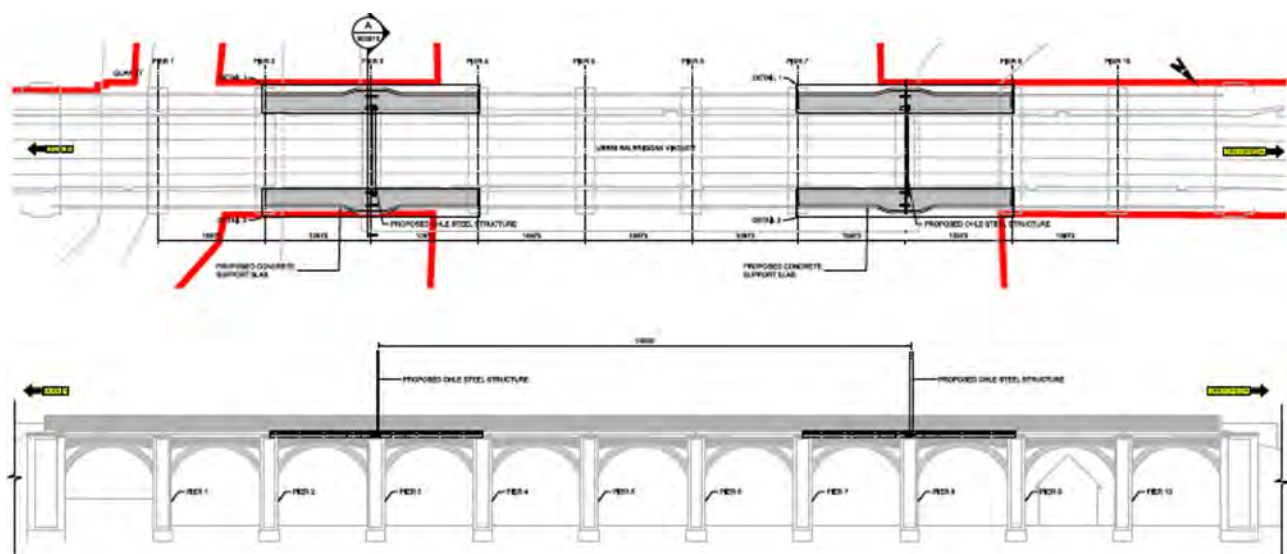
Plan and Elevation of Balbriggan Viaduct (UBB56)
